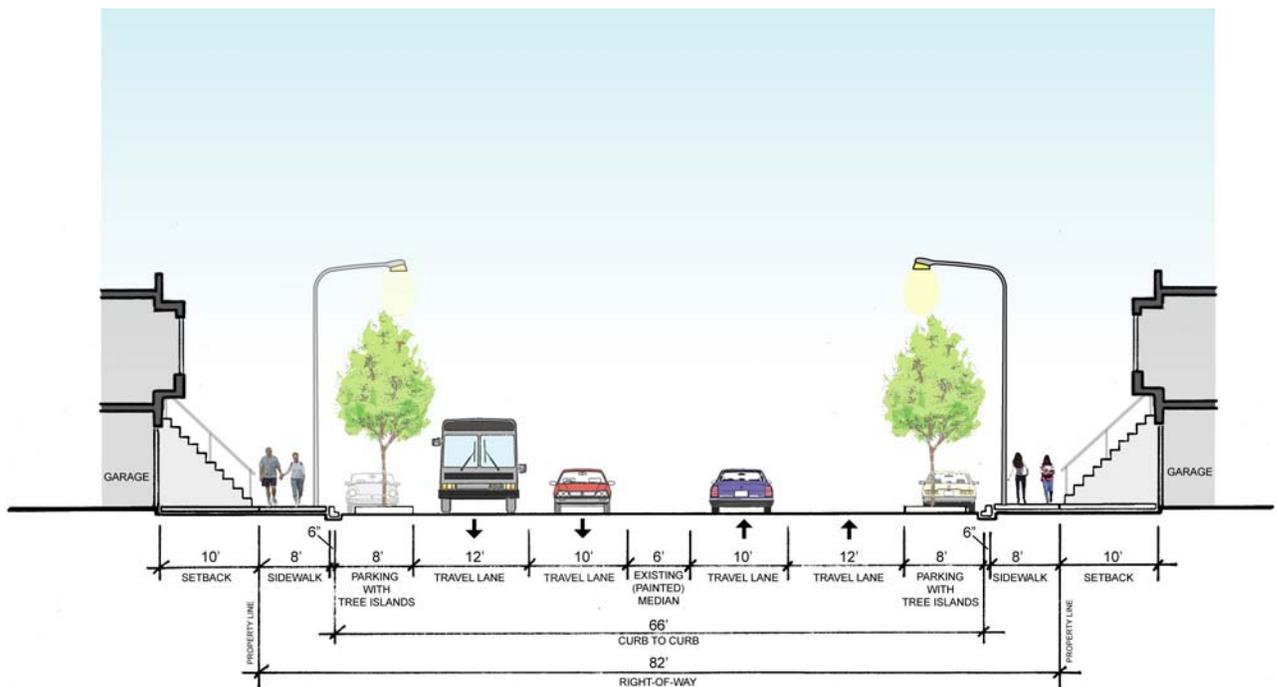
Option A calls for providing tree plantings in the parking lane
